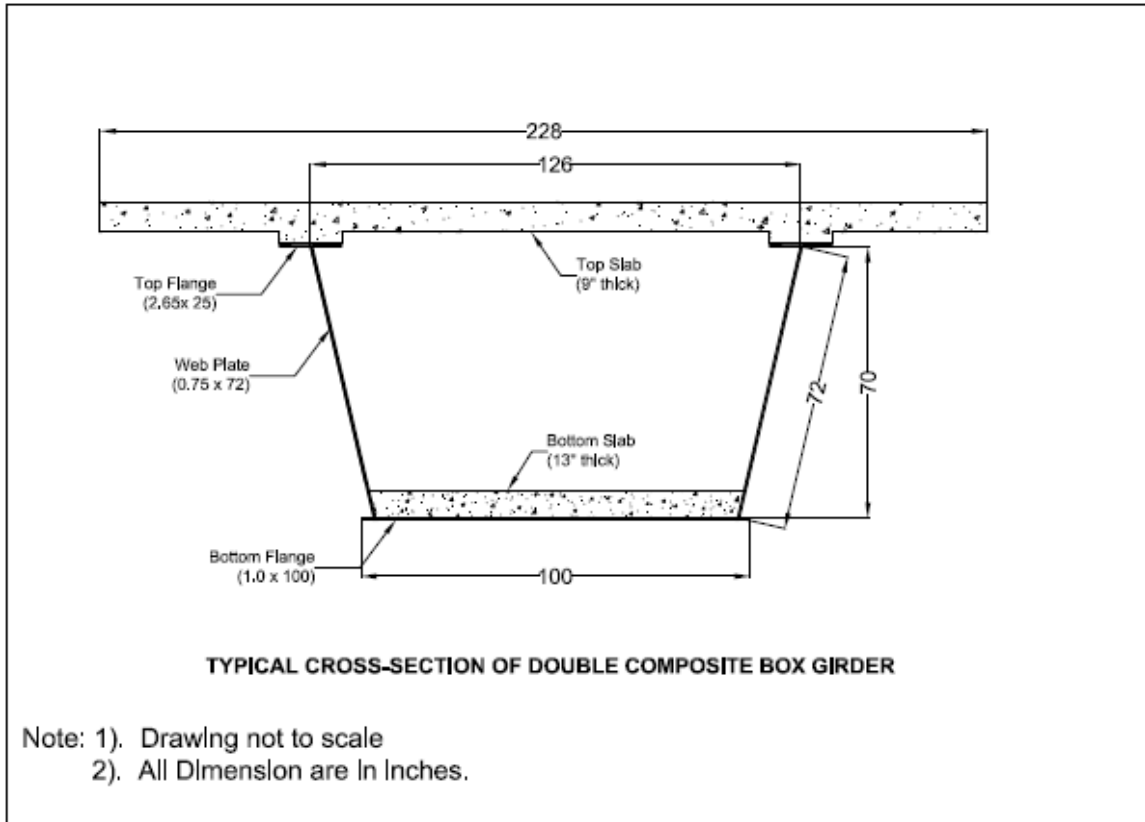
Typical Cross-section of Double Composite Box Girder
